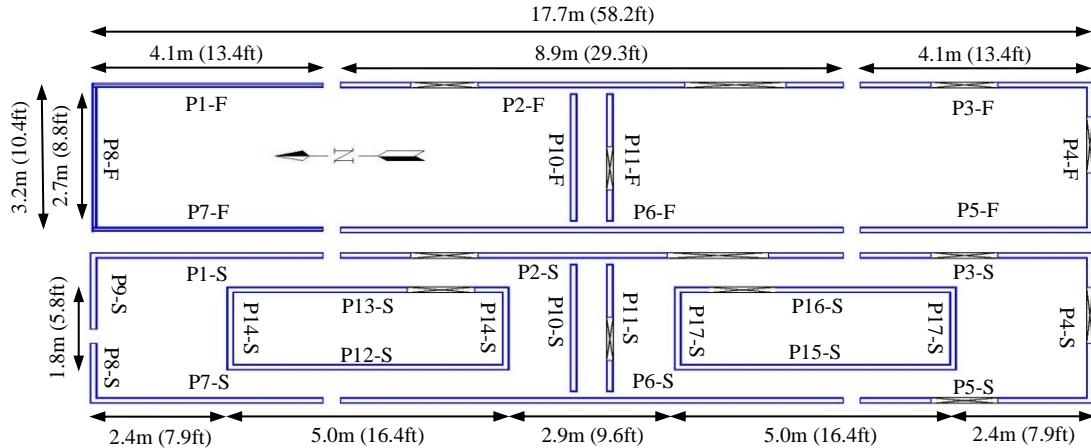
Partition Wall Layout: (top) first floor, (bottom) second floor
